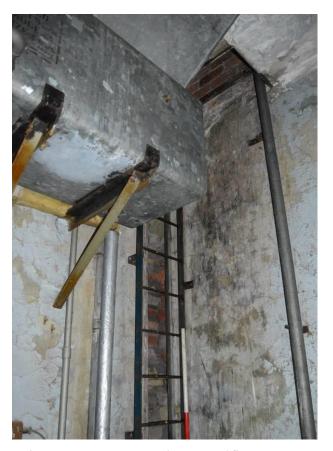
Later water tank to second floor tower room. Scale 2m. Facing east.
